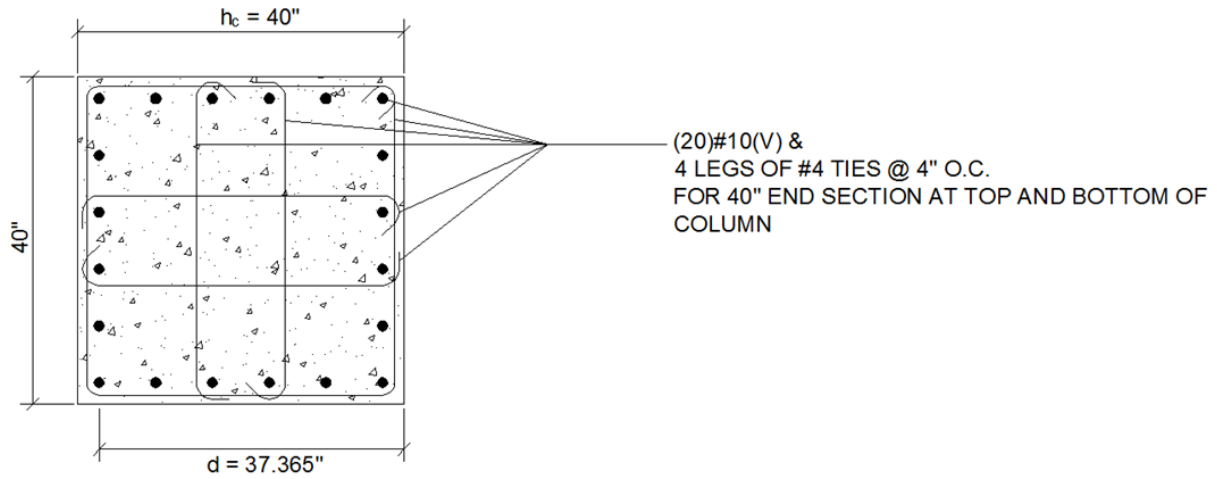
Exterior column, cross-section at end section of column at the 3rd floor level based on tsunami design requirements.
